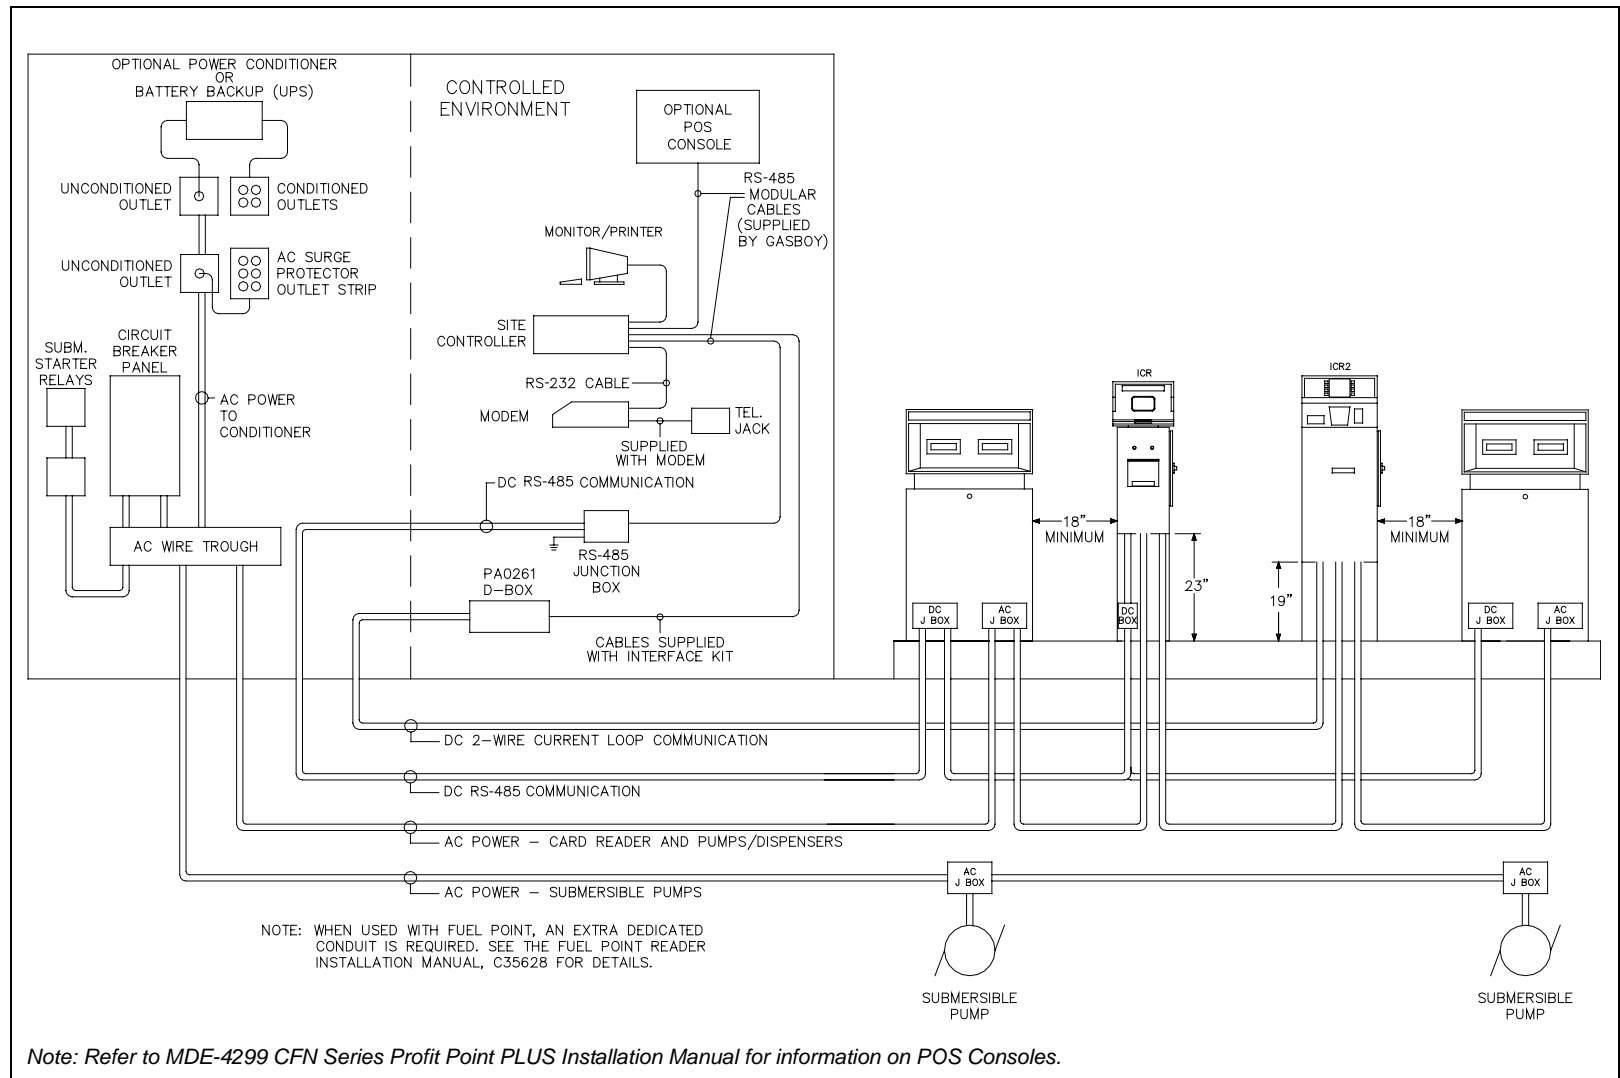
Conduit Layout - Wall-mount Pump Control, Mechanical Hose Outlets
